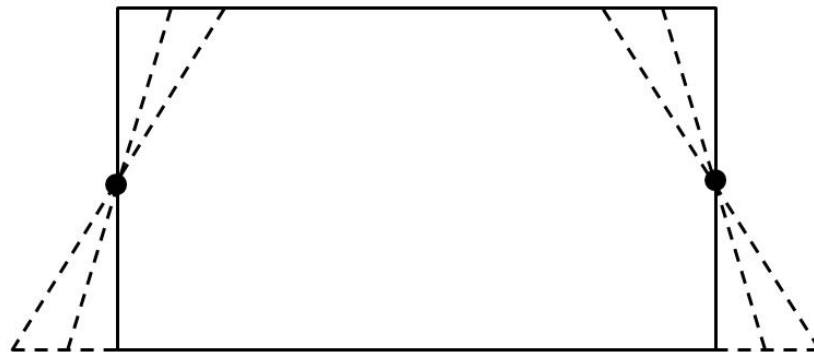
Transformation from rectangular slab to trapezoidal slab
